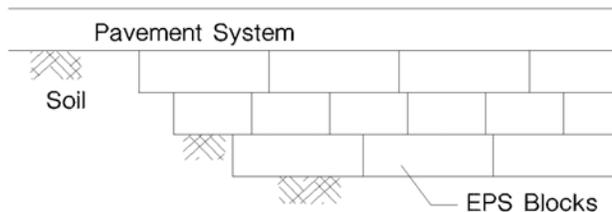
Cross-sectional view along longitudinal axis of roadway showing a typical EPS block transition to a soil subgrade (Horvath, 1995).
